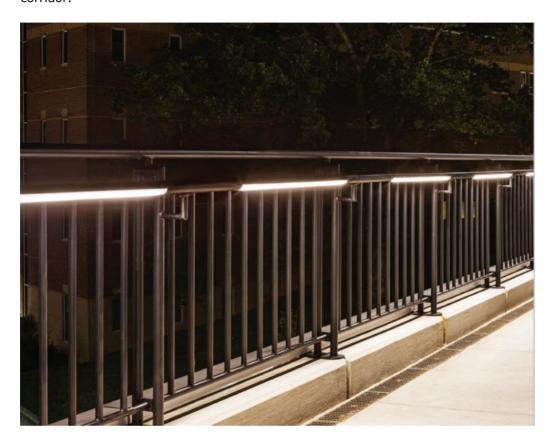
Typical bridge handrail lighting. Source: www.intenselighting.com (n.d.).
